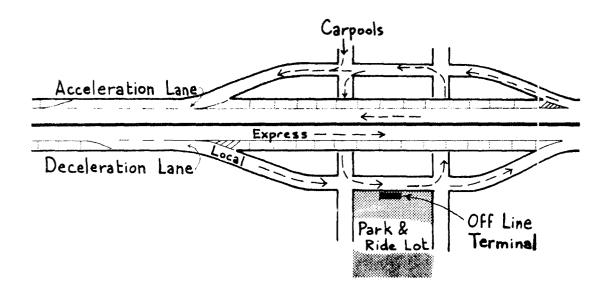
Typical Site Plan at Station, Wide Guideway for Buses and Carpools, Elevated Guideway
